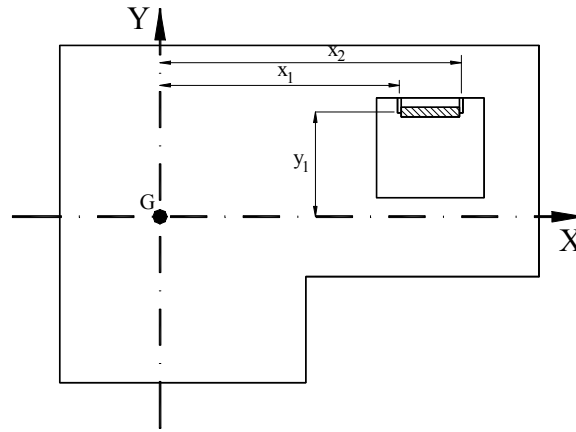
Plan View of the Building Slab, Elevator Shaft, and Counterweight
